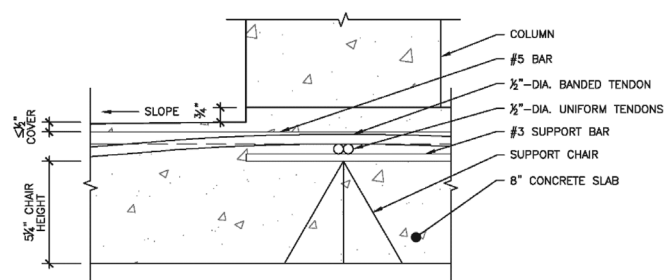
As-specified reinforcing layout at balcony slab turndown.
